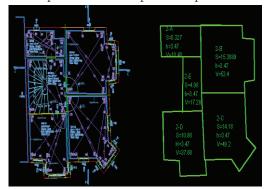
The floor plan of apartment complex and the generated apartment boundary on two floors: the ground floor (left); the first floor (right)
